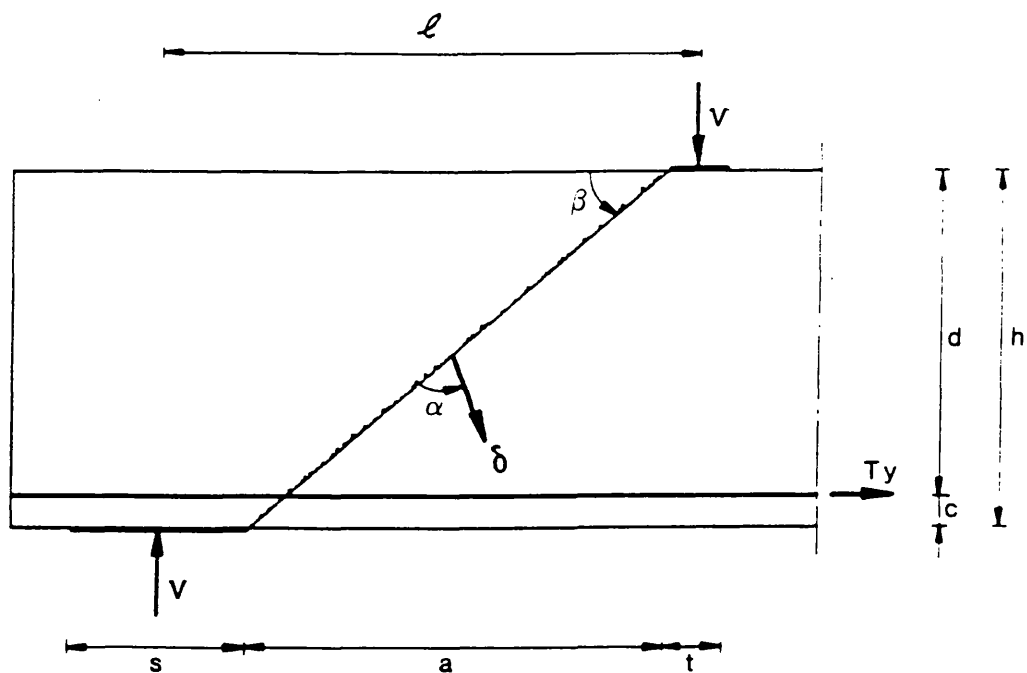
Failure Mechanism for Beam with Point Loading
